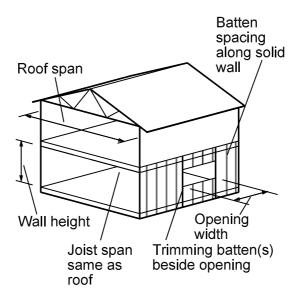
External Wall Battening – Lower of Two Storey or Subfloor – joist spanning between external walls
